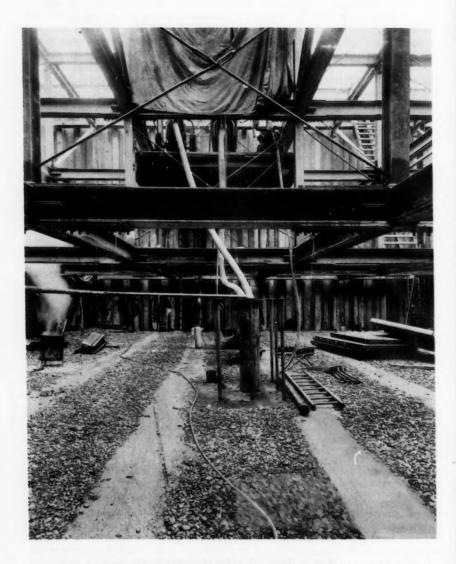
INTERIOR OF COFFERDAM, ELRAMA STEAM STATION. CENTRAL SUMP IS SHOWN AT CENTER WITH PUMPS ABOVE. TWO INCH THICK CONCRETE STRIPS HAVE BEEN PLACED IN TOP OF GRAVEL FILL TO SUPPORT CHAIRS FOR REINFORCEMENT.
